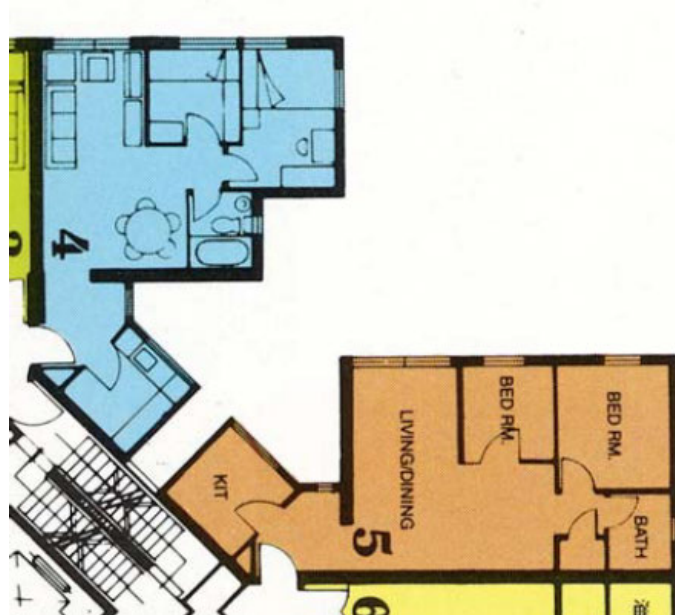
Typical re-entrant of building blocks of Wang Fuk Court
